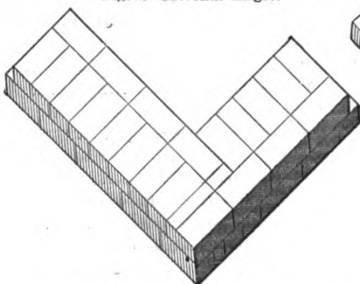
External Angle of Wall One and One-Half Bricks Thick.
